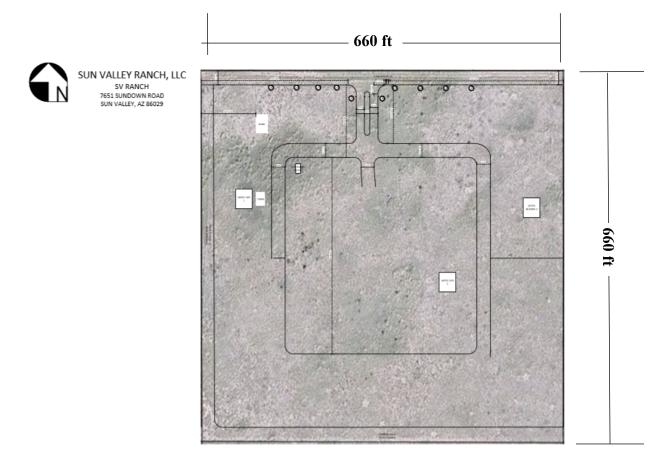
Current Site Plan for the Sun Valley Ranch (10-Acre Parcel)
